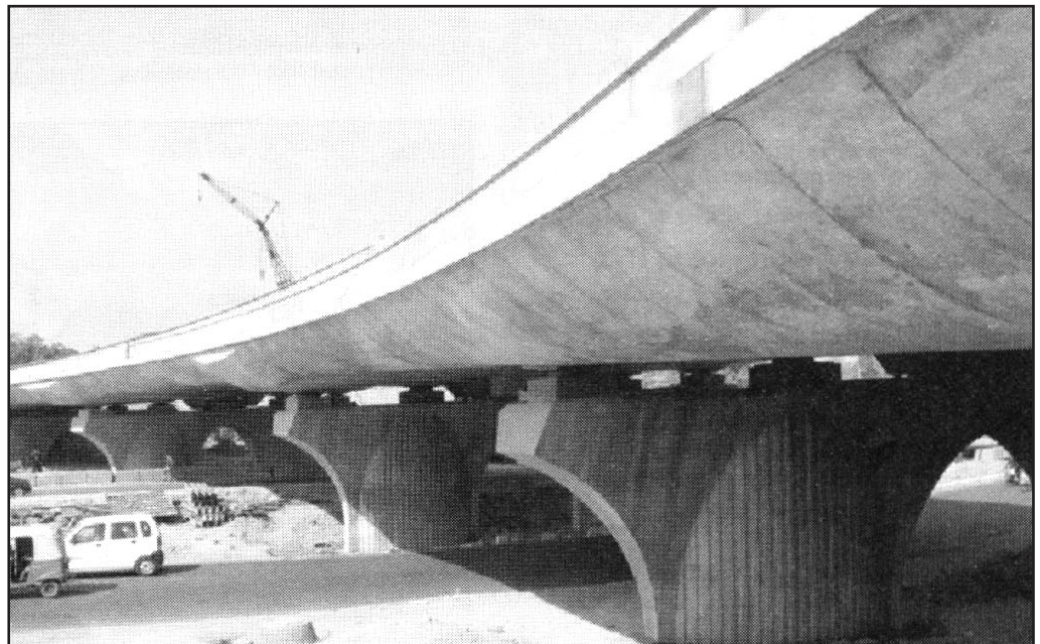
AIIMS-Safdarjung crossing; note the streamlined shape of deck and architecturally shaped piers
